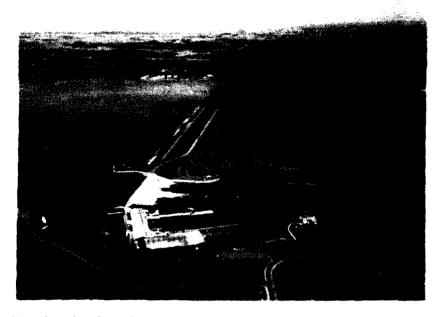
Aerial view of Gavins Point Dam, looking north. Sept 1978.
